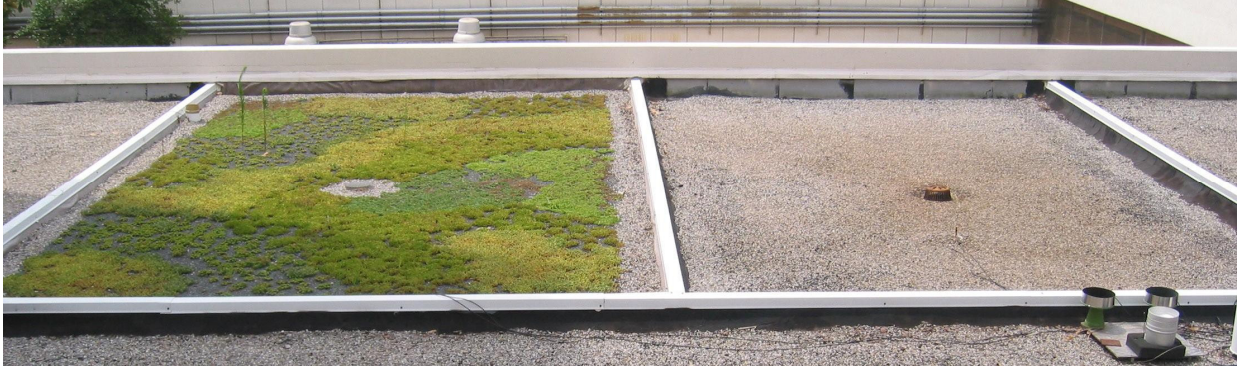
Picture of traditional extensive green roof and typical gravel ballast roof
